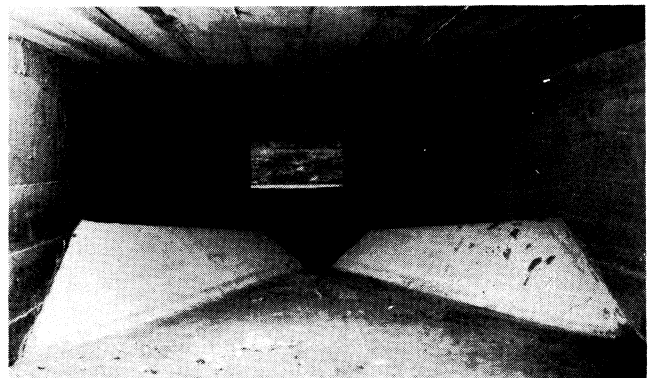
Precast weir sills installed in a 4 foot deep by 8 foot wide highway culvert.
